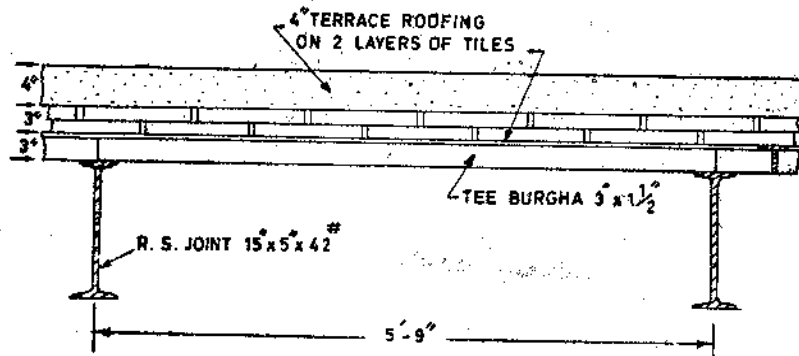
A. Roof of Court Room, First Floor, Civil Court, Laheria Serai.
